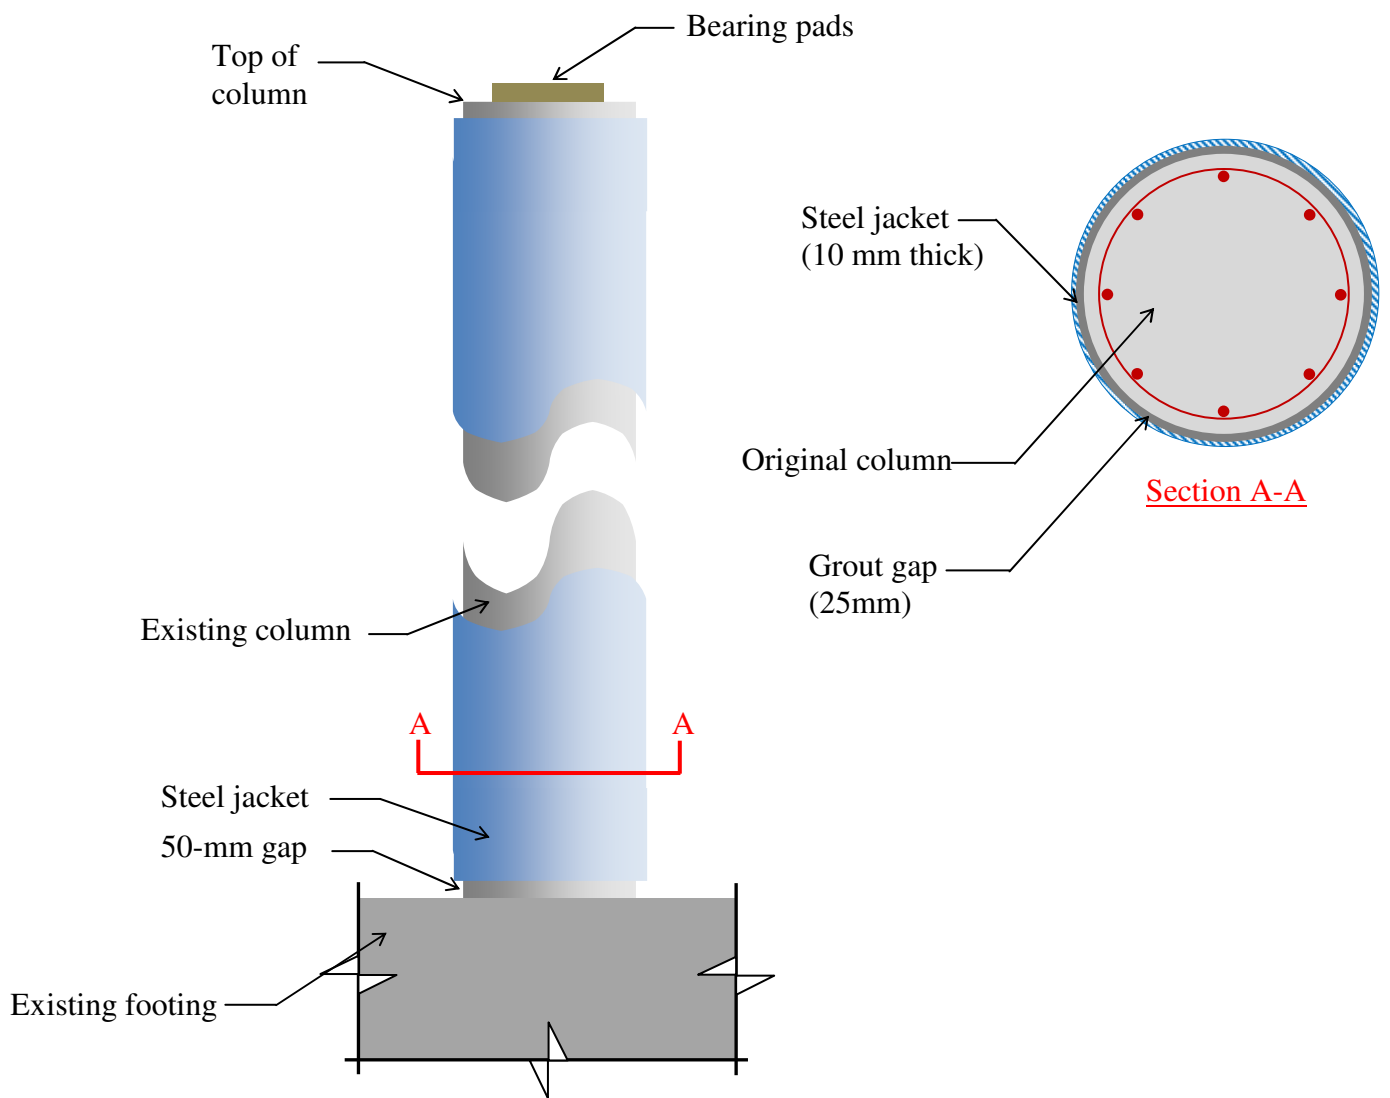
Retrofit scheme for Pier #3 and Pier #4 columns in Almahata Bridge.
